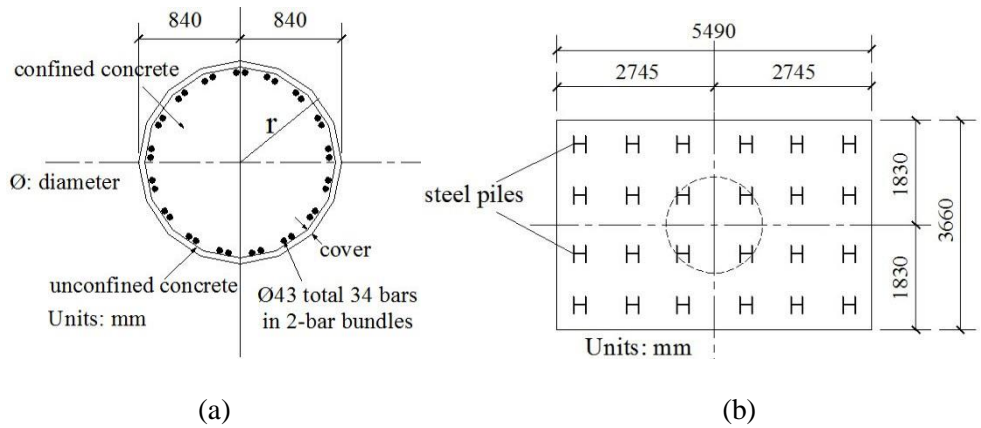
Bent detail: (a) Column cross section; (b) Footing plan (adapted from Caltrans, 2008)
